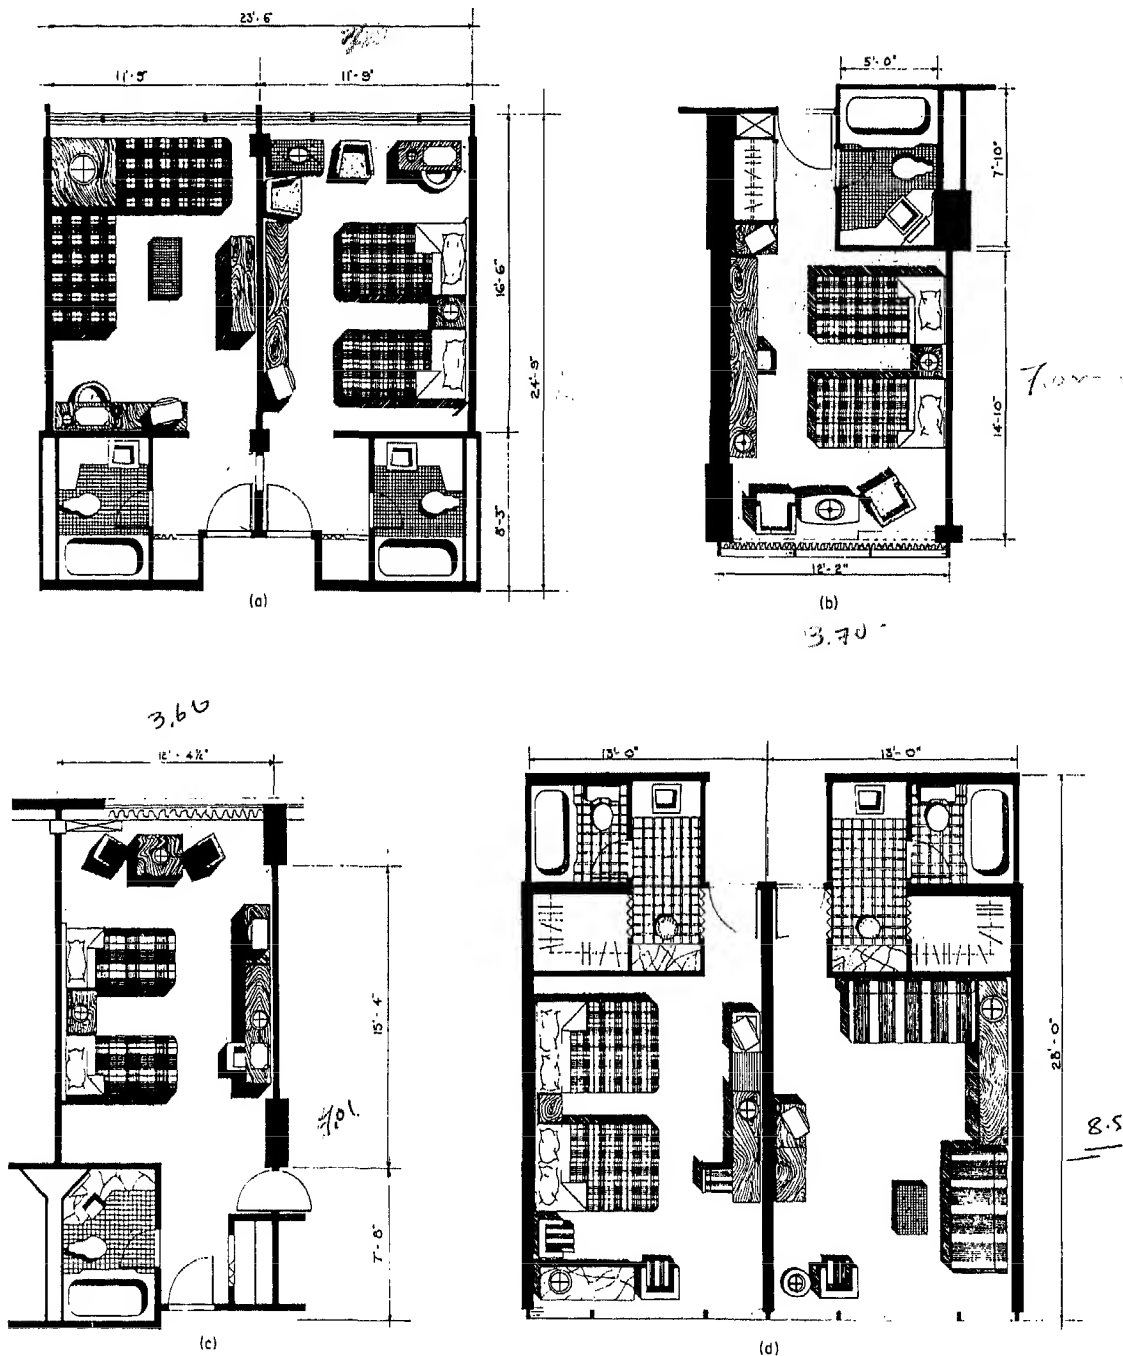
(a) Uris Brothers Hotel, New York. (b) Americana Hotel, New York, typical tower room. (c) Loews N.Y. Motel, typical room. (d) Causeway Inn, Tampa, Florida.
